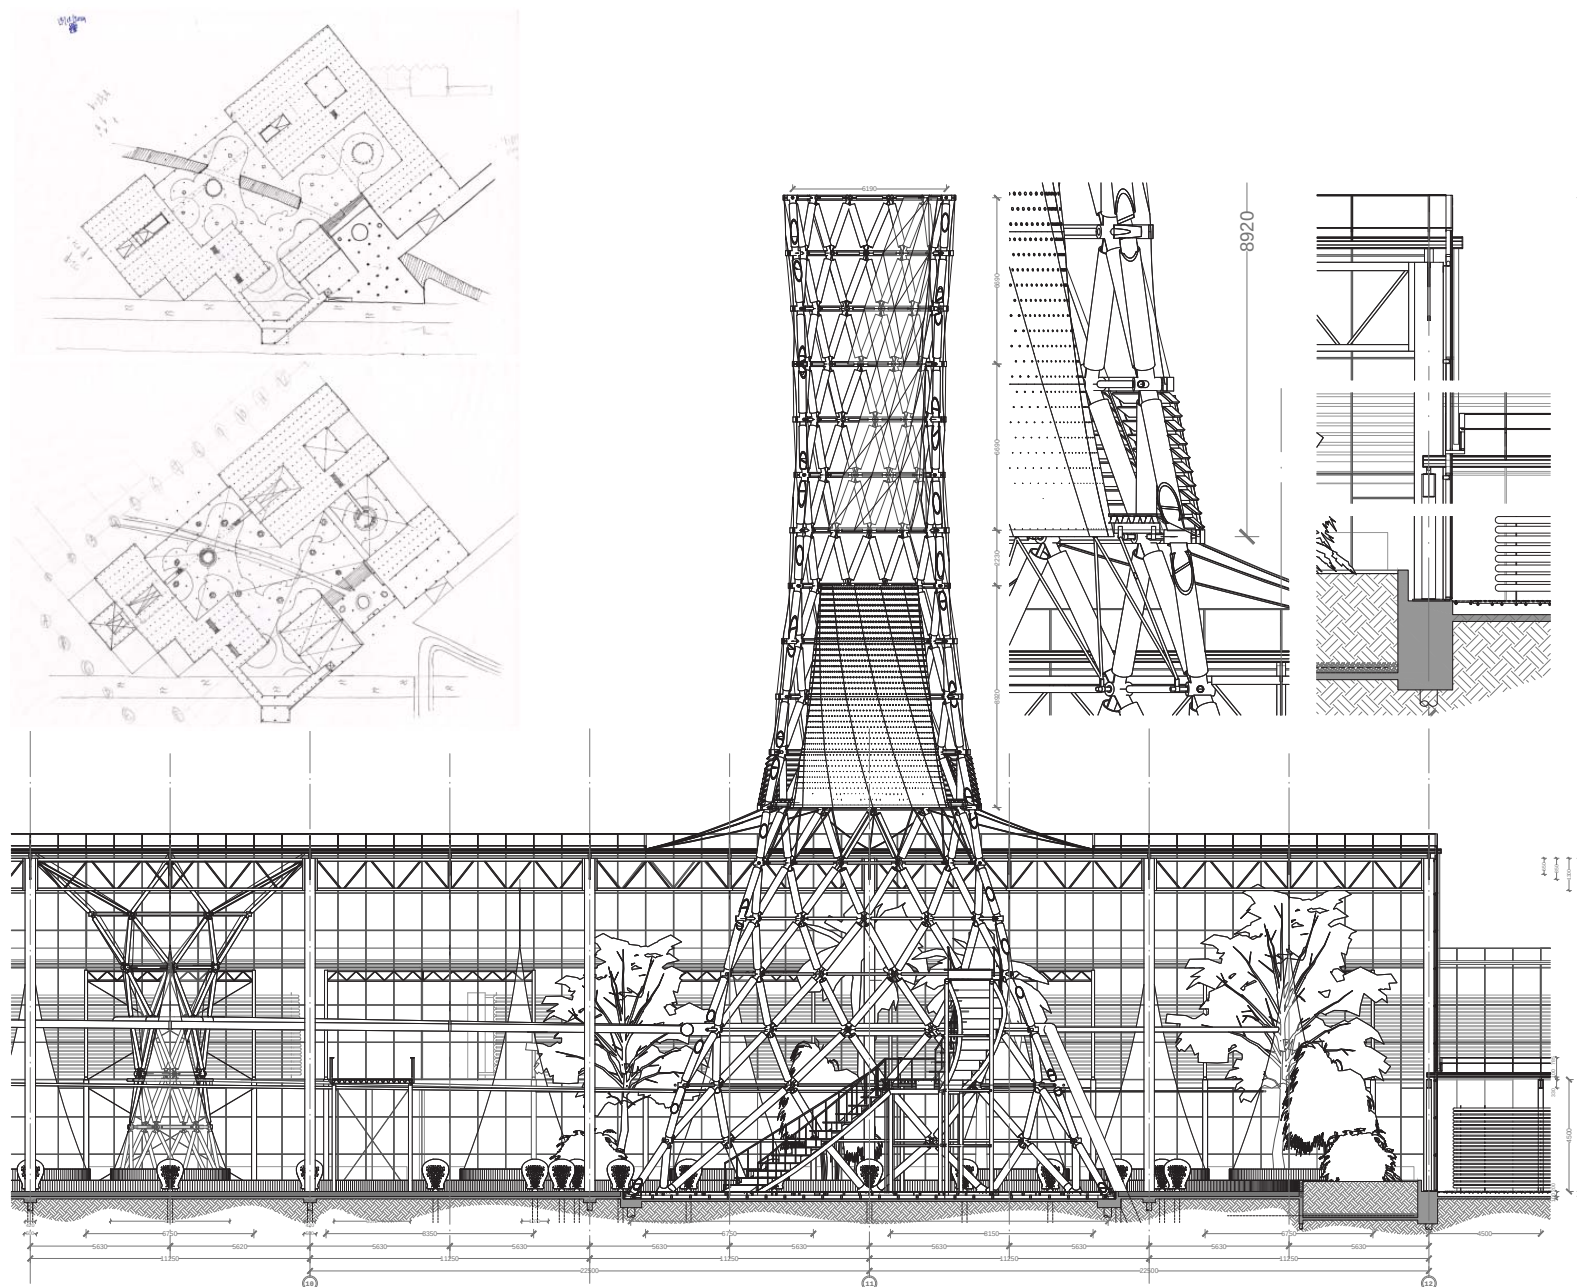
Scaled 1:500 floorplans and 1:50 and 1:20 sections through large chimney.
